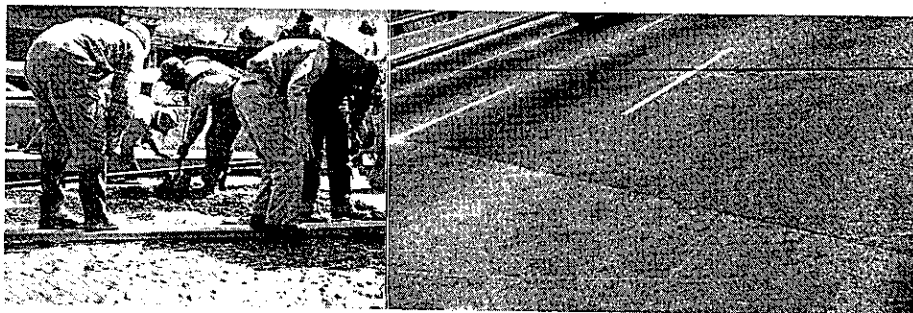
(Left) Placing portland cement concrete on old concrete coated with epoxy adhesive. (Right) Repair after 15 months under traffic
